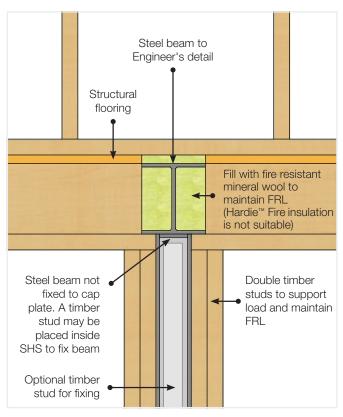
STEEL BEAM AND COLUMN PERPENDICULAR TO FIRE WALL - ELEVATION VIEW
